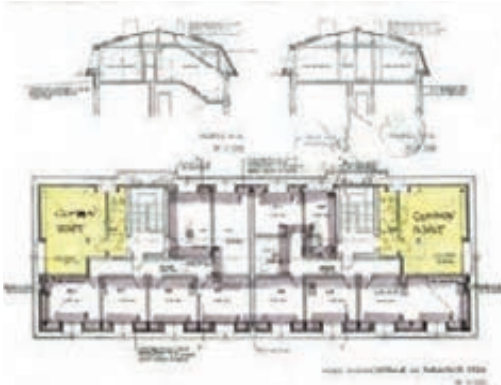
| Roof reconstruction plan of the pilot building (credit: G. Georgiev).
